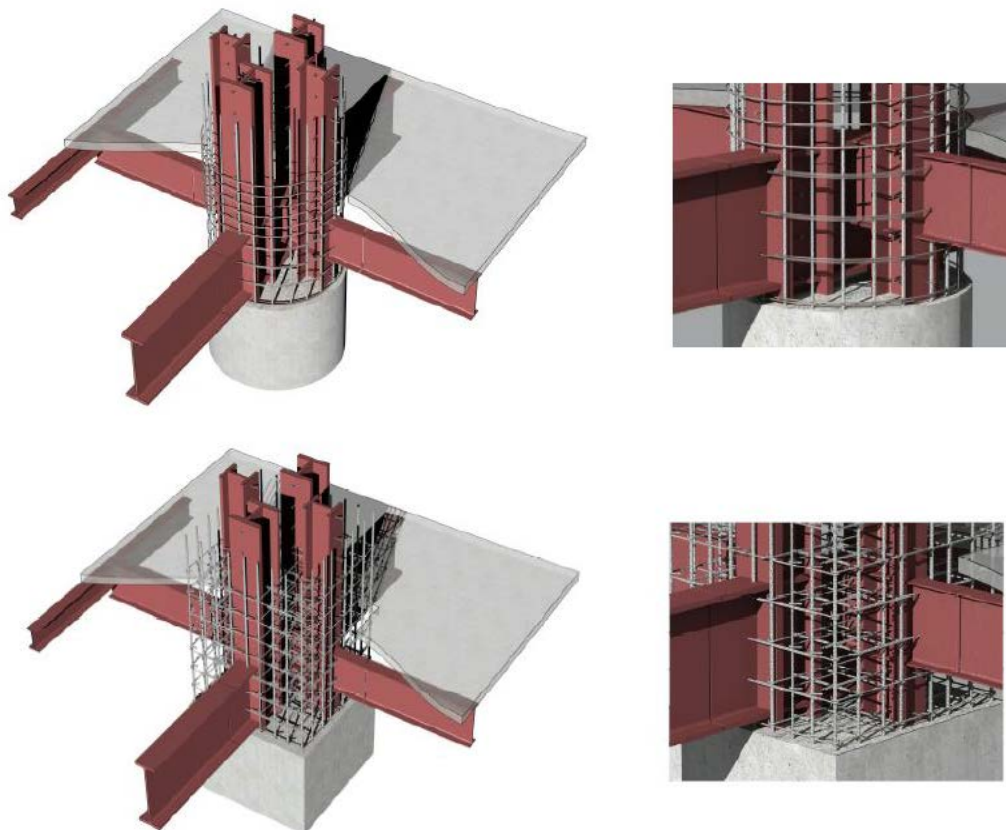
Layout of ISRC columns with round and square cross sections (provided by MKA)
